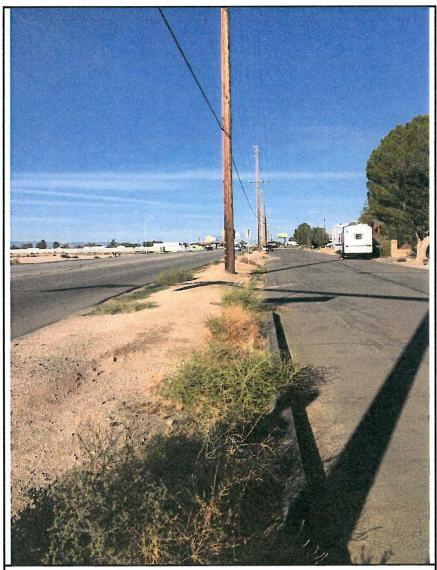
View facing west of disturbed area proposed for sidewalk construction.
